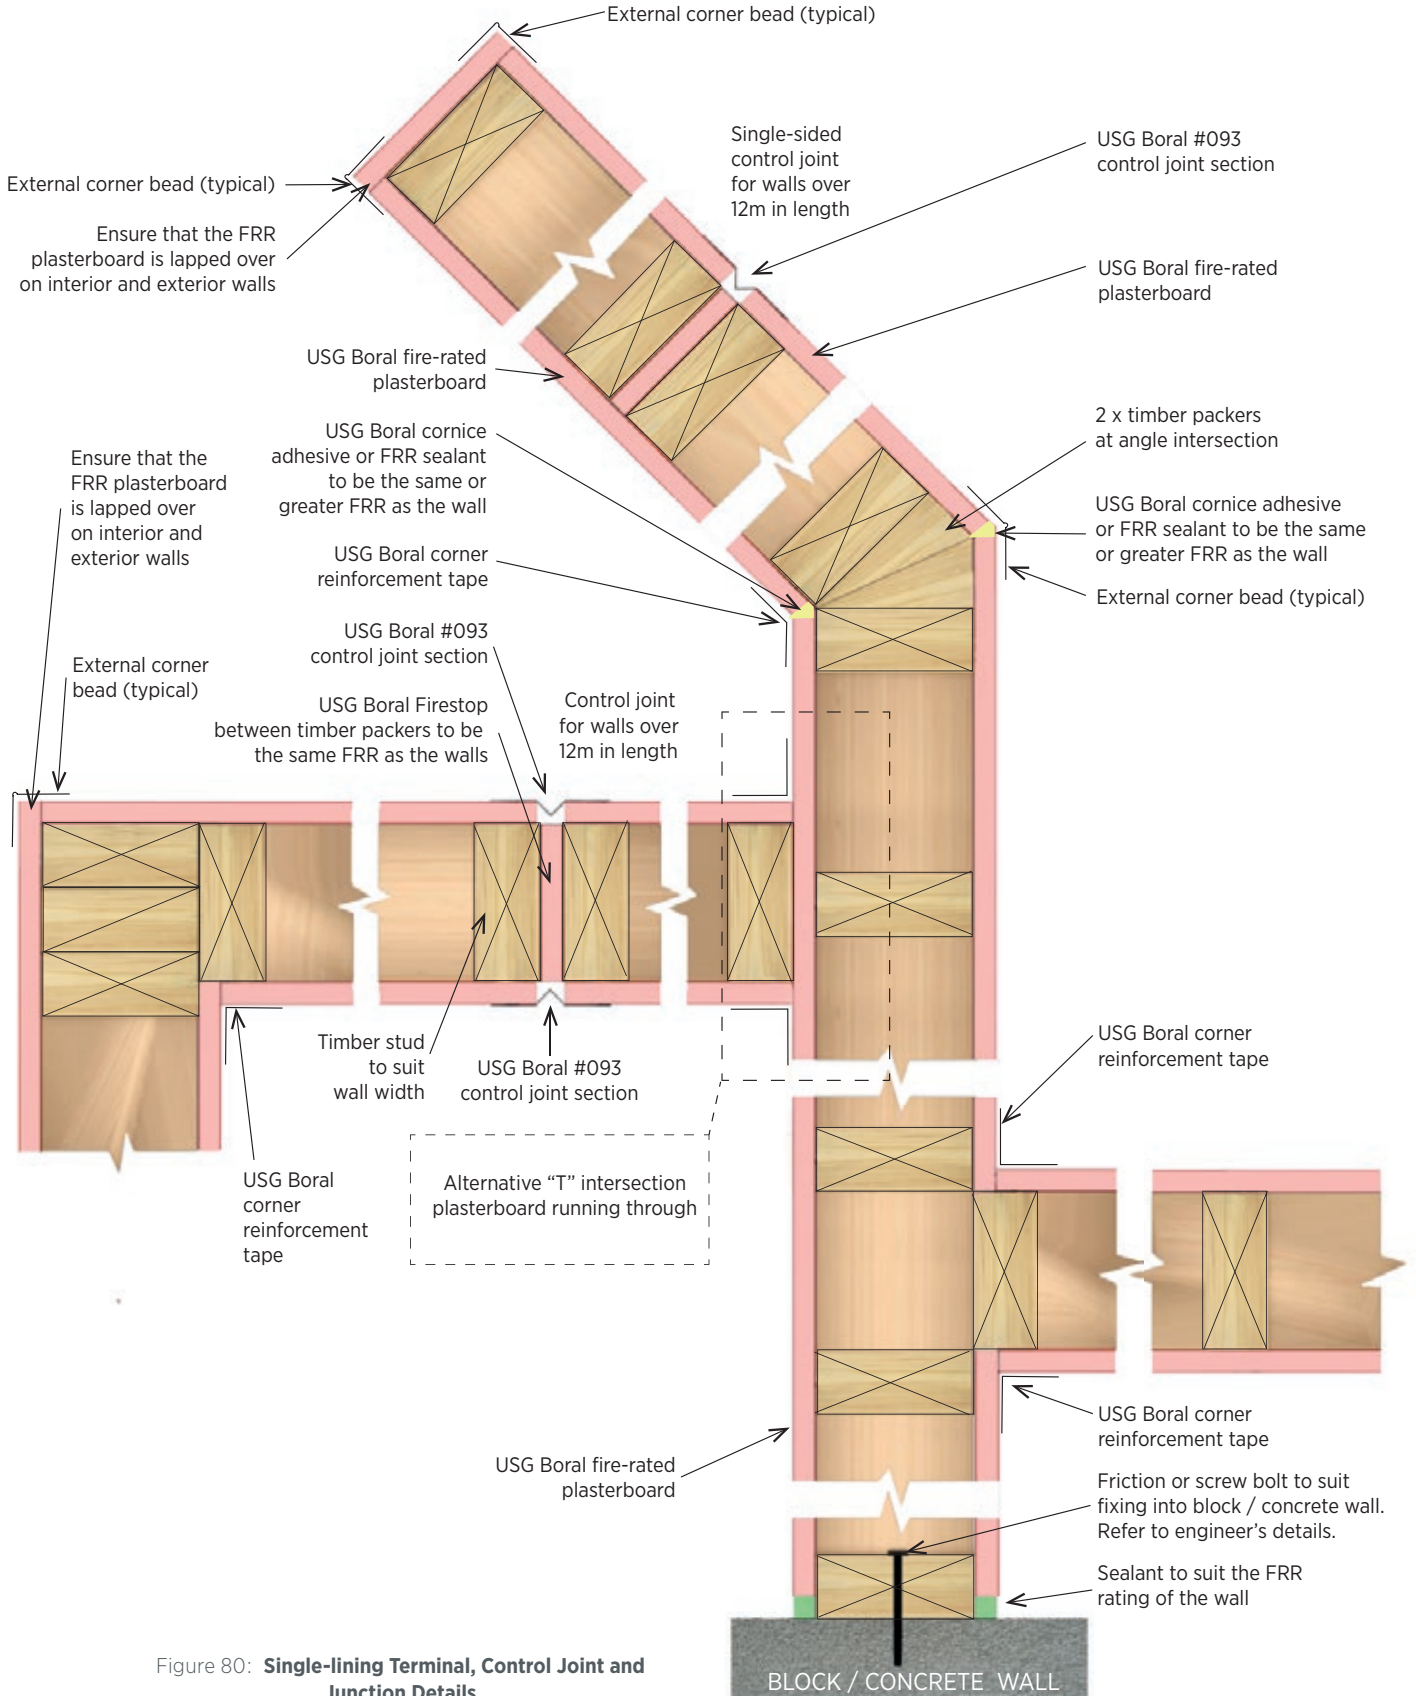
Single-lining Terminal, Control Joint and Junction Details
